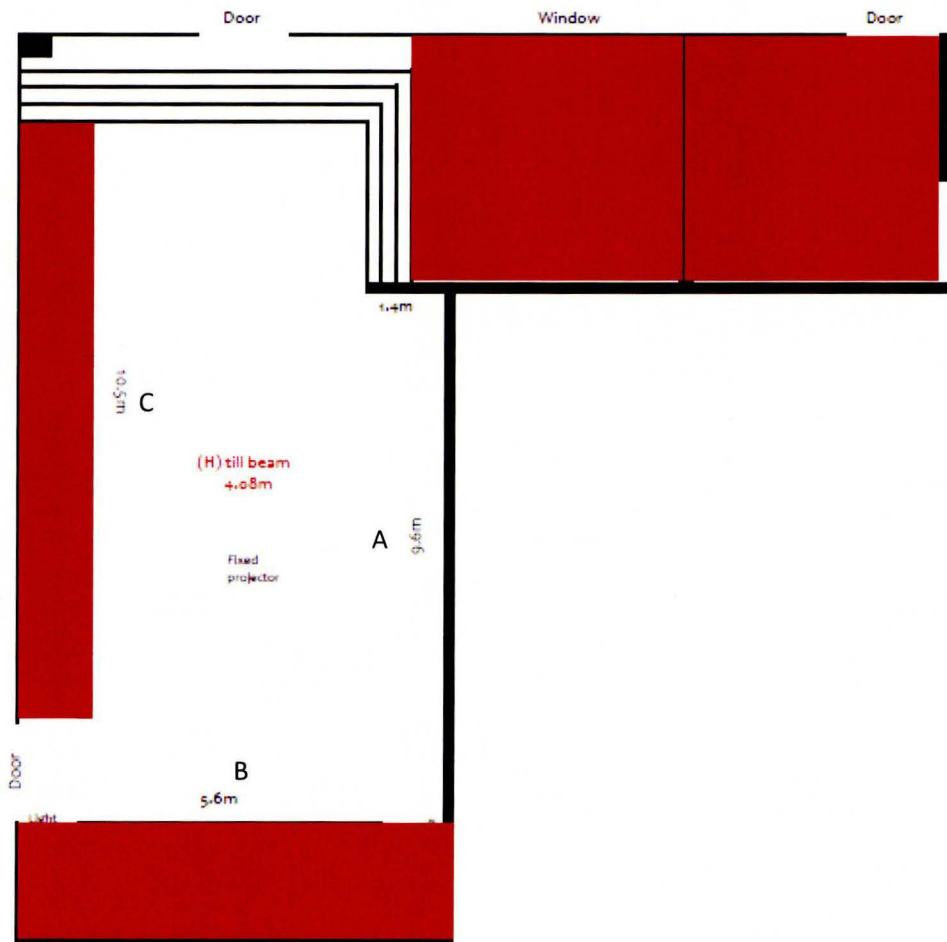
The Point of Order Project Space – Basic Floorplan WSOA
